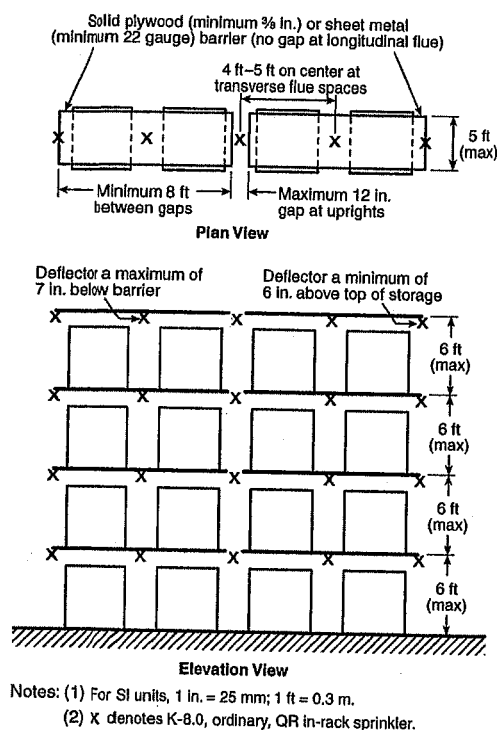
(a) Single-Row Rack Sprinkler Layout for Design Scheme "B" — Sprinklers in Center of Rack. [30: Figure 16.6.2.1(a)]
